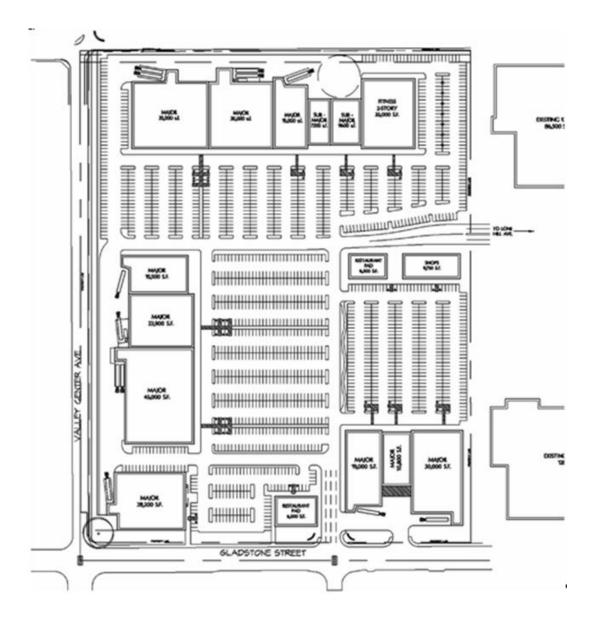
illustrates proposed site plan with retail/shops/theater/pads tenants indicated.
